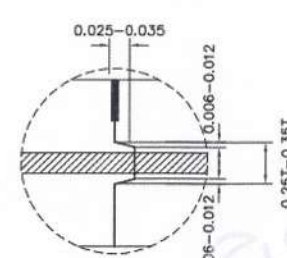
DETAIL OF SAWS FOR LONGITUDINAL JOINT
